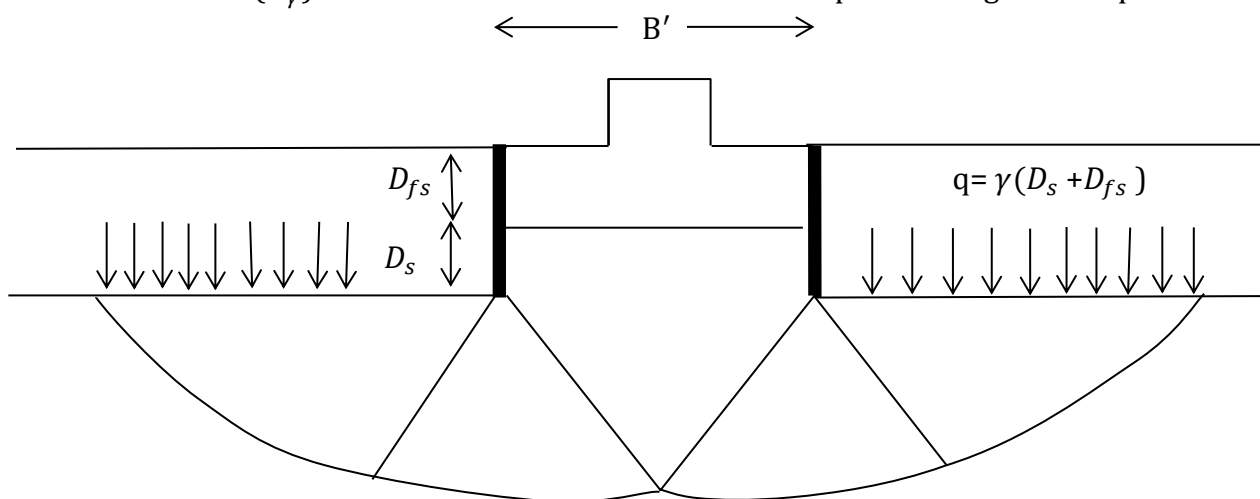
Failure mode in soil under continuous footing with structural skirt subjected to vertical load. (Al-Aghbari and Mohamedzein, 2004)
